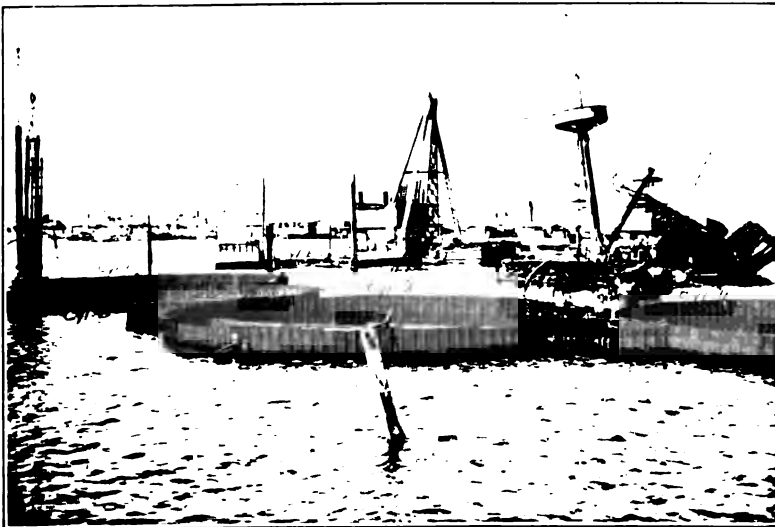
COMPLETED CYLINDER AND CONNECTING ARC.
